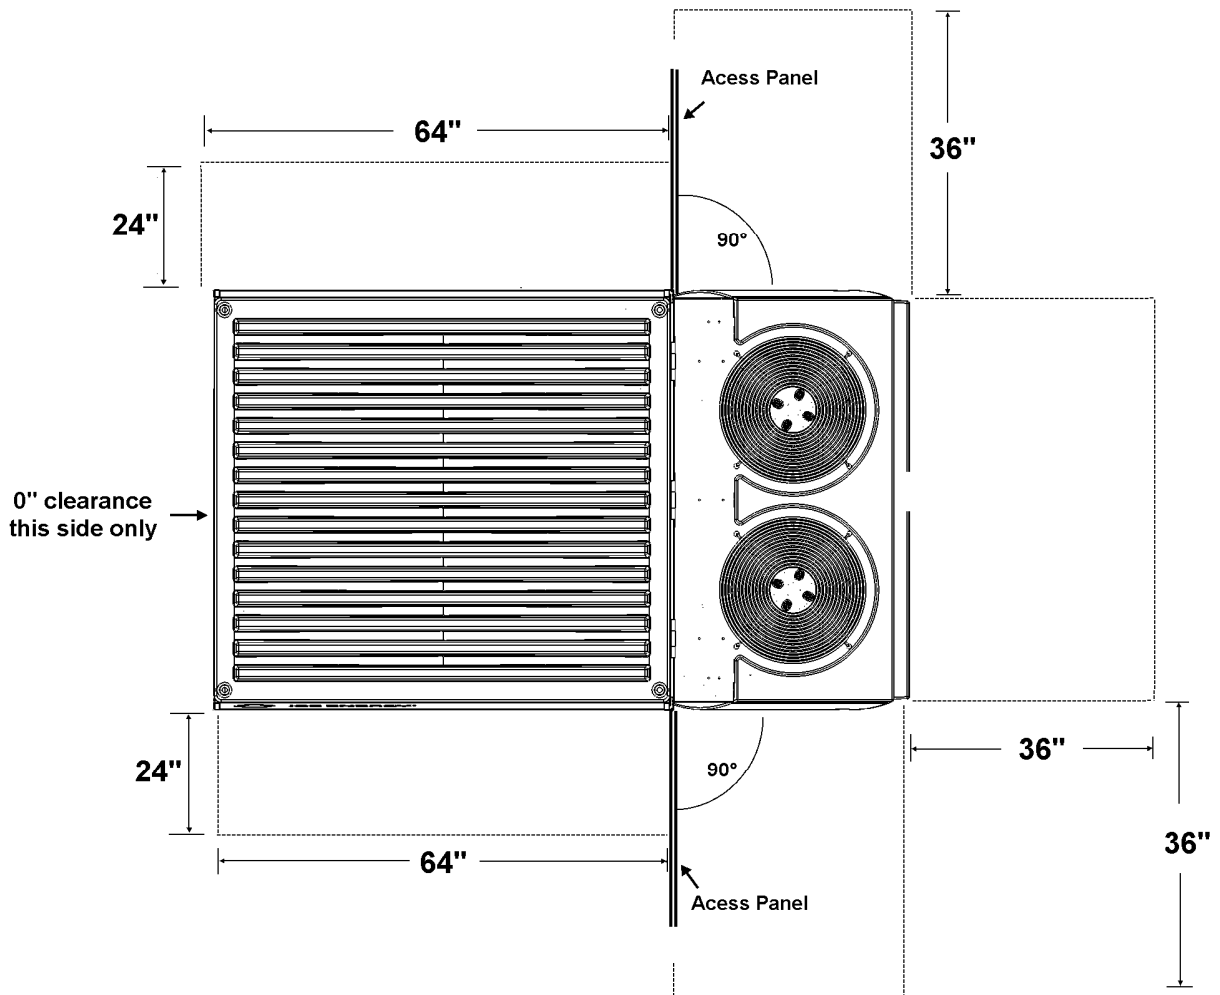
Minimum Clearances for Remotely Mounted Service Disconnect
